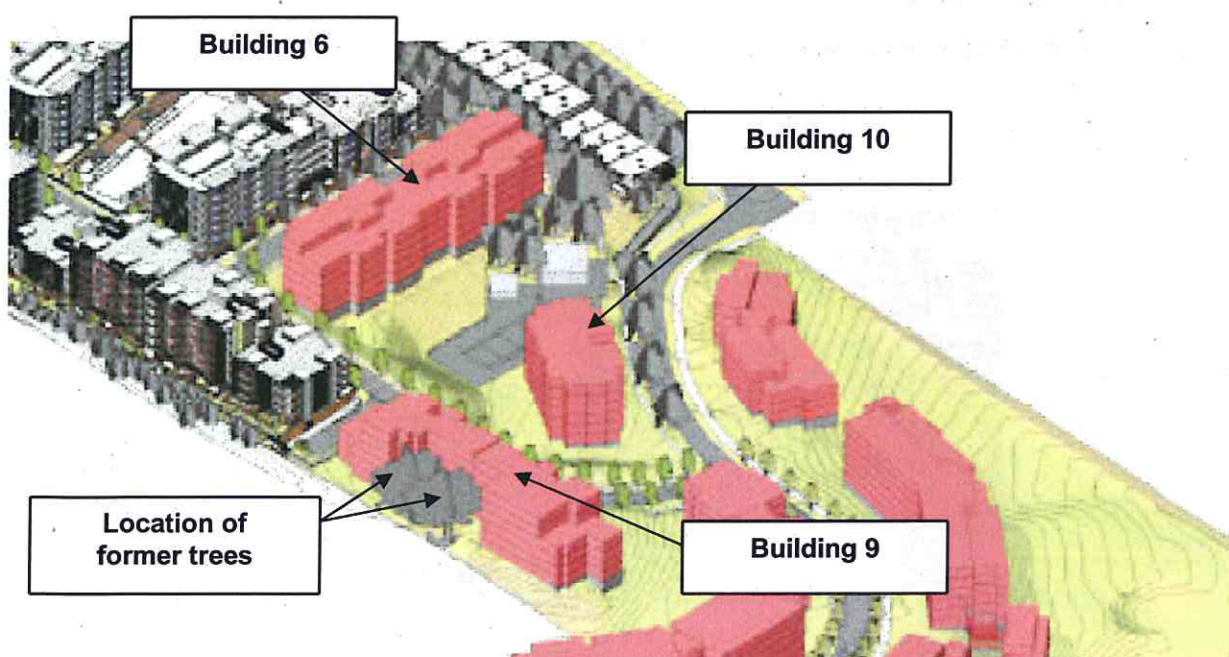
Approved Building Envelopes (Source: Concept plan Modification Proposal, PPR)
